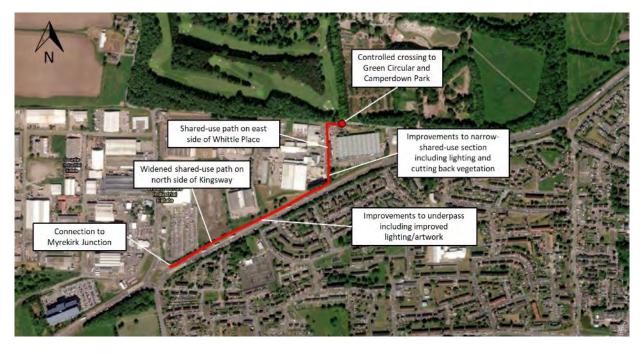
Option E1e: Liff Road to Myrekirk Junction, Widened Shared-Use Path (Alternative to Two-Way Segregated Cycleway)
